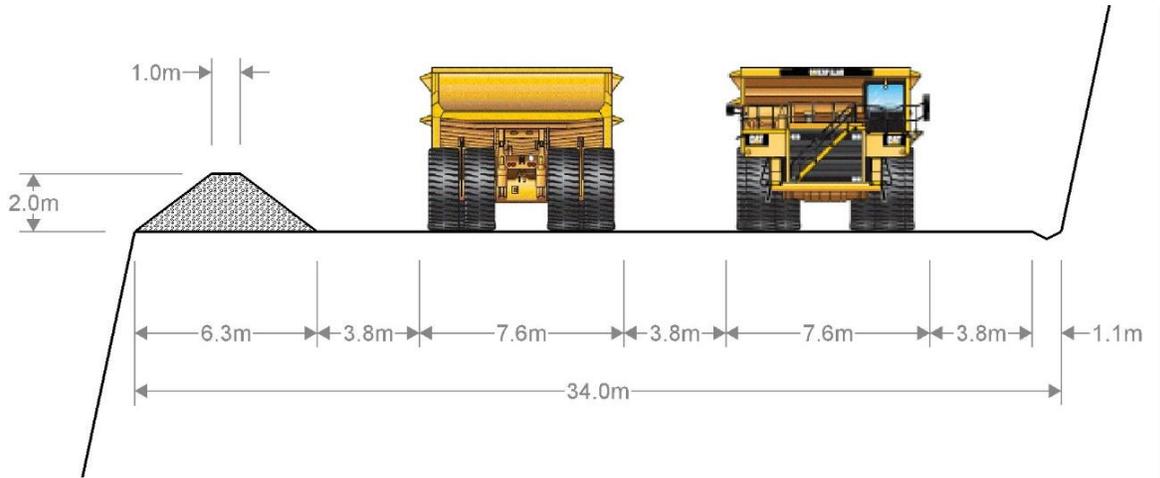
Typical Mine Haul Road Cross Section (metric)
